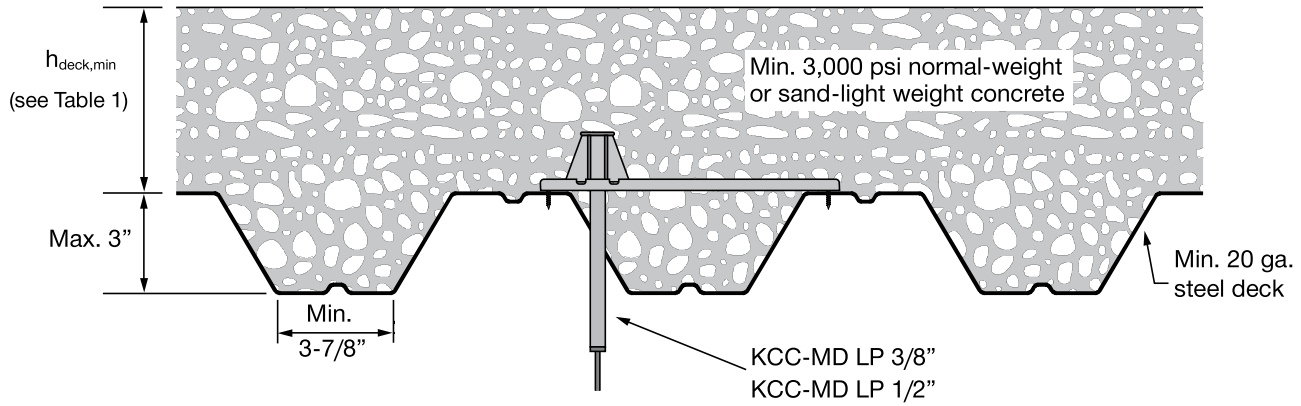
D — Installation of KCC-MD inserts in the soffit of concrete filled metal deck floor and roof assemblies-over flute incline (W-deck)
